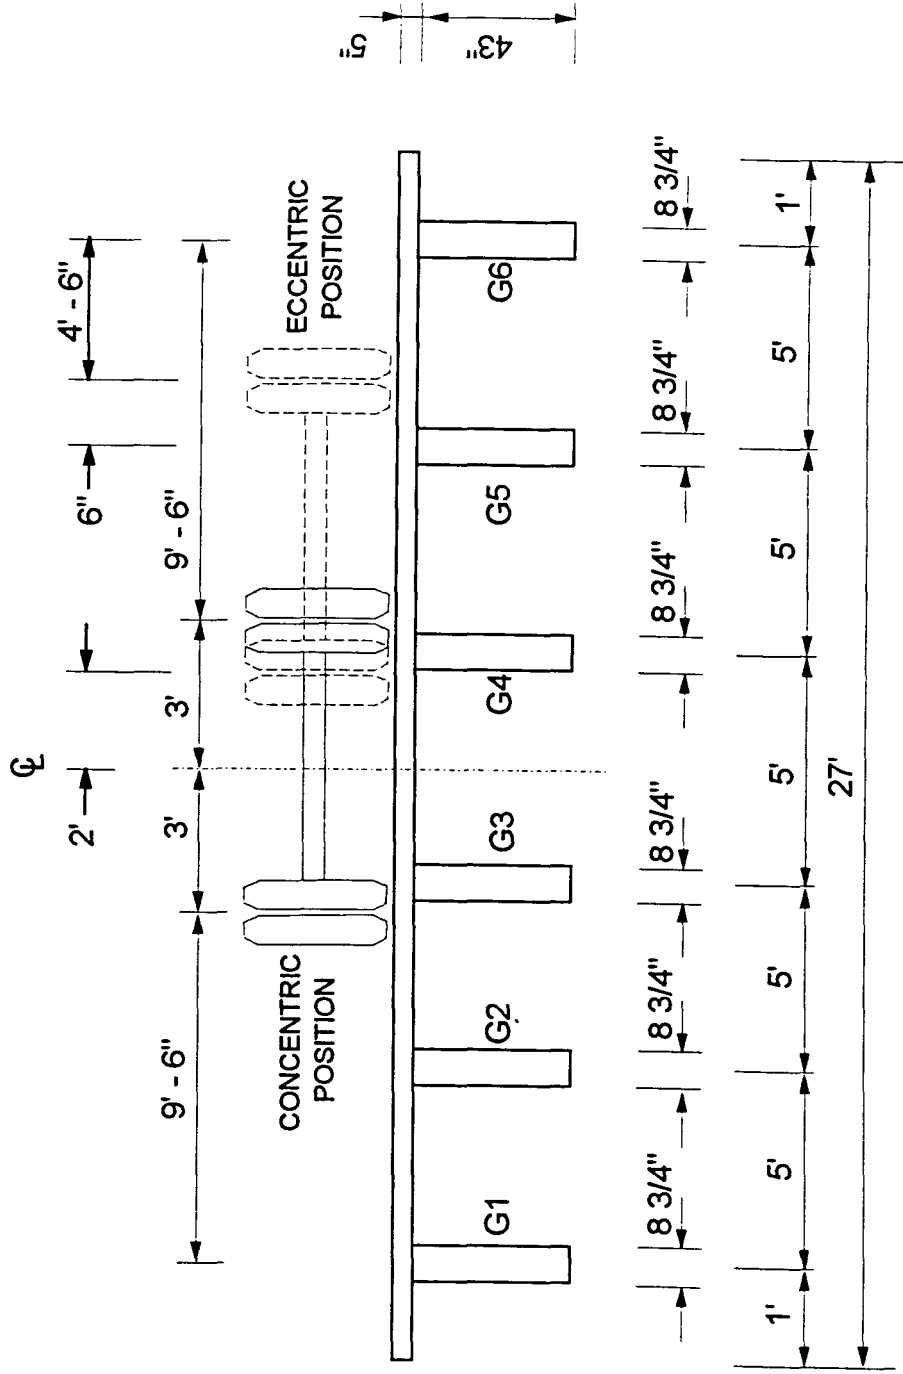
Chambers Co. Bridge - cross section dimensions and transverse positions of the vehicle
